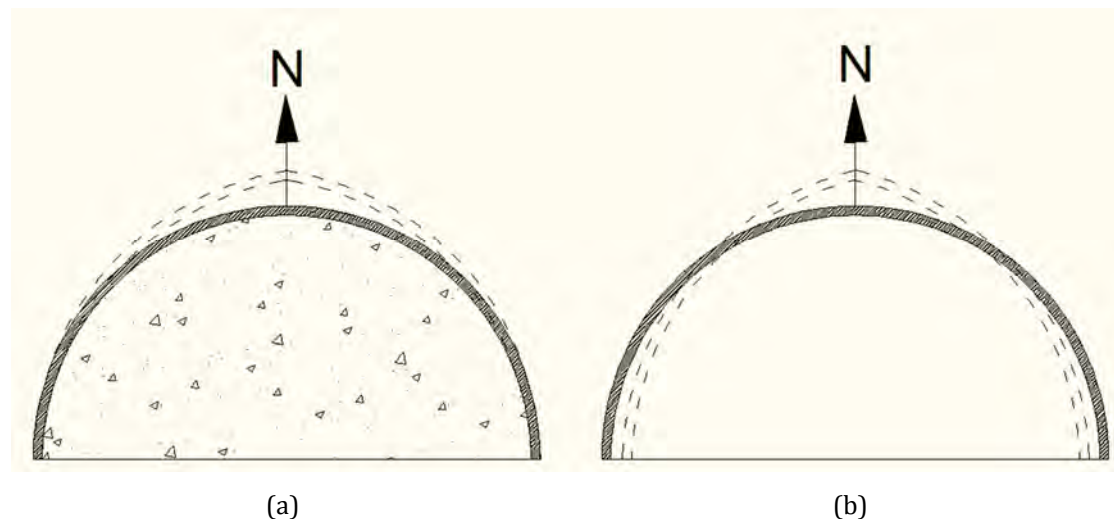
(a) Concrete column wrapped with steel jacketing under perpendicular tension loading; (b) CHS section under perpendicular tension loading
